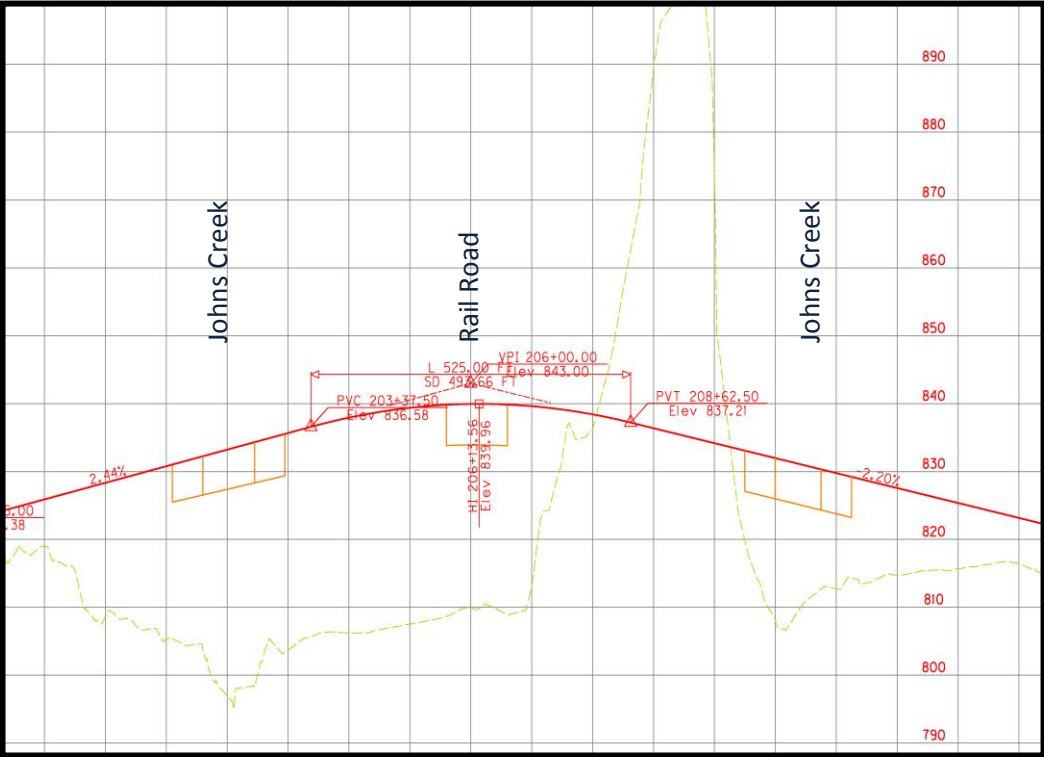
Proposed Profile of Section 2 Alternative 1 at High Ridge Mining Near MP 22.5
